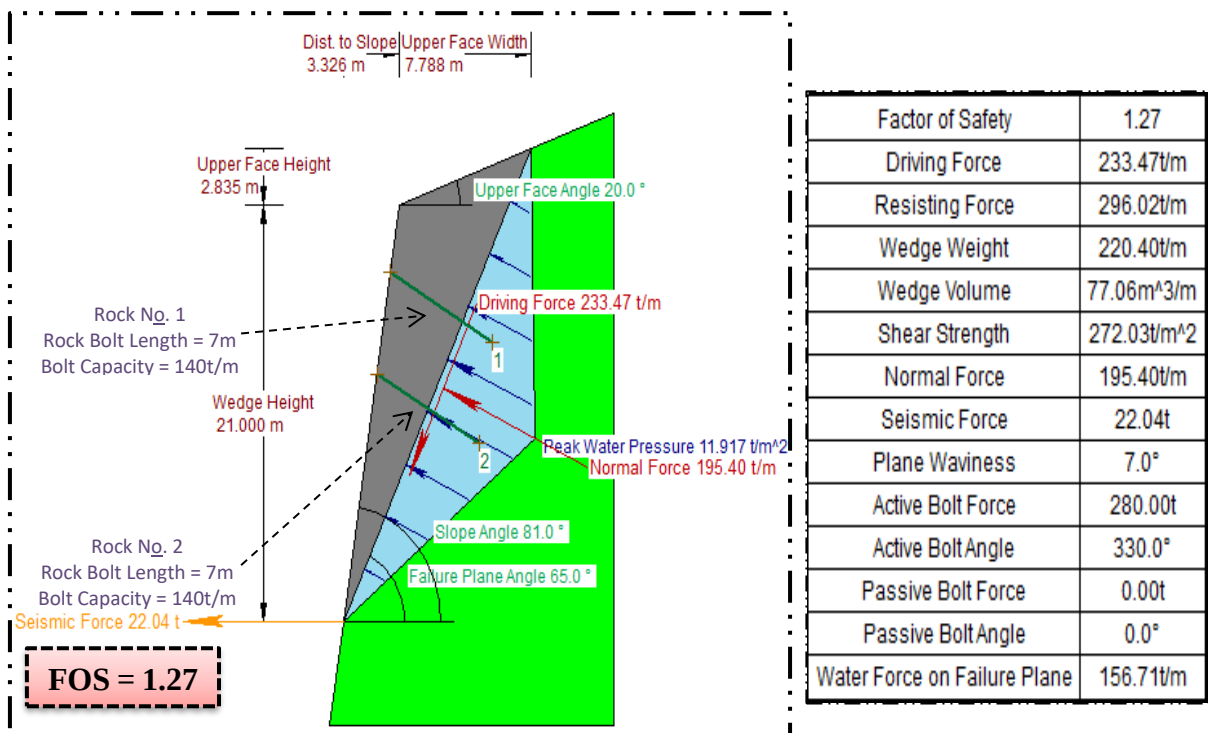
26. Remedial measures for Planar Mode Failure and FOS at Left Abutment Slope Section (LASS).
